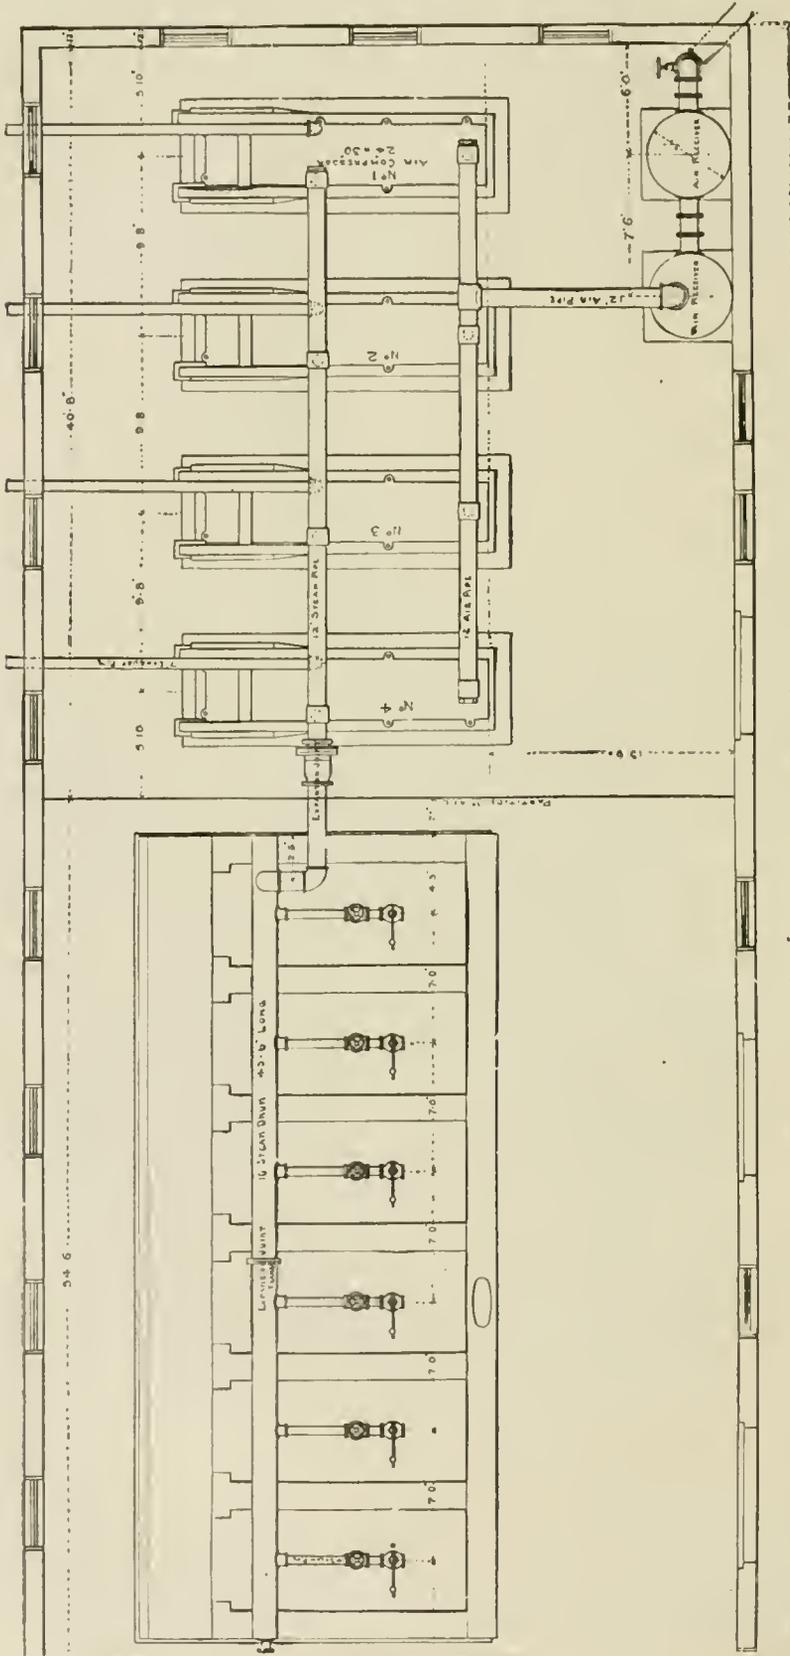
Air Compressor Plant at Washington, D. C., Aqueduct Tunnel. Ground Plan.
